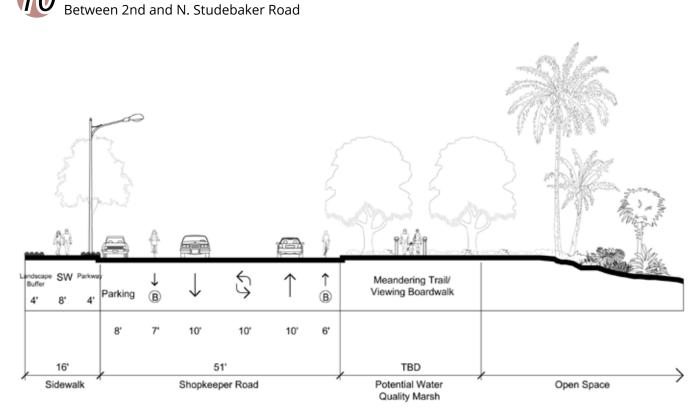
Shopkeeper Road Option 1 Between 2nd and N. Studebaker Road
